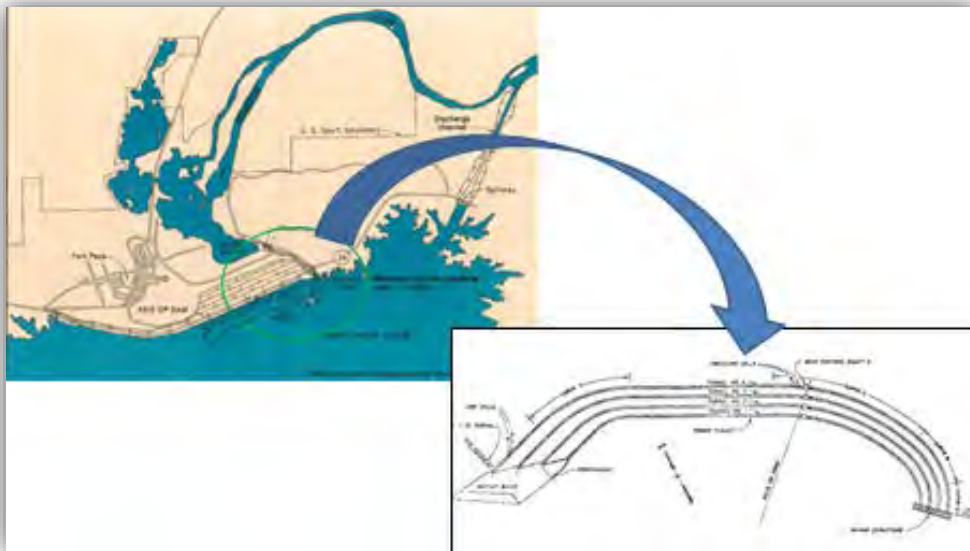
Plan View – Multiple Level Intake with Connection to Tunnel 4
